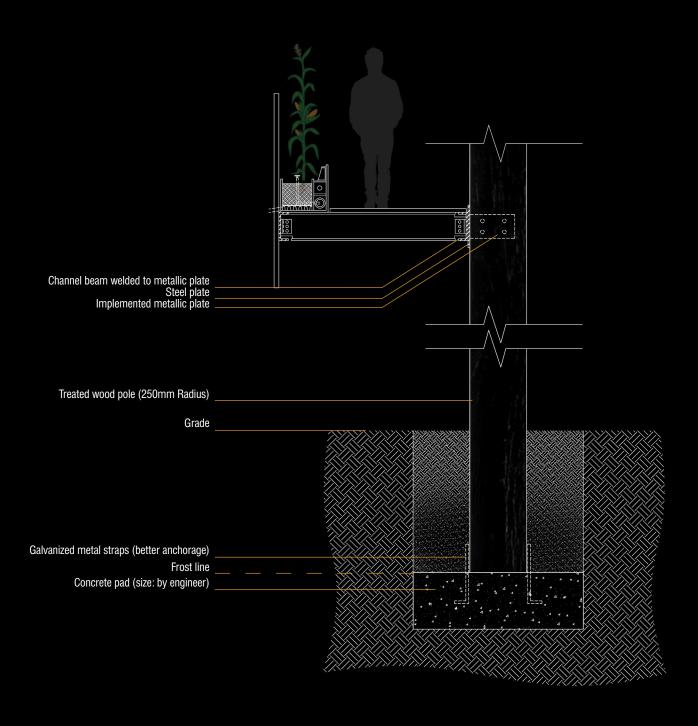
Assembly Detail: The Poles, the Walkway, the Planting Box
